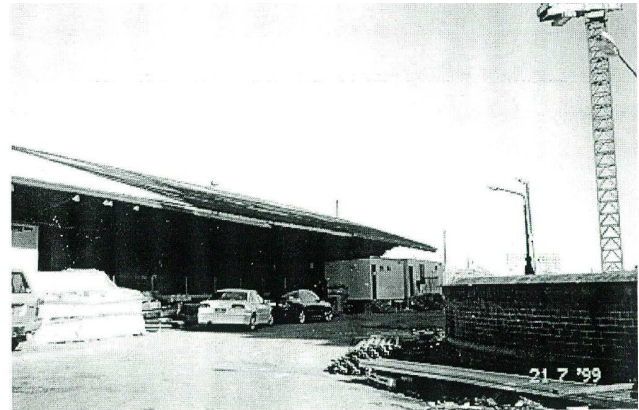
Looking southeast at the west elevation of the Inwards Parcels Shed Ramp
